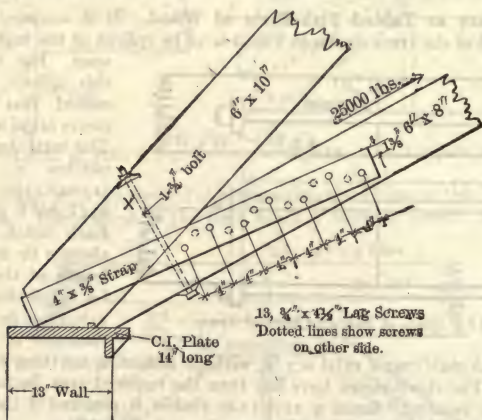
Wall-joints for Scissors Trusses, Figs. 24 to 27, Chapter XXVI
